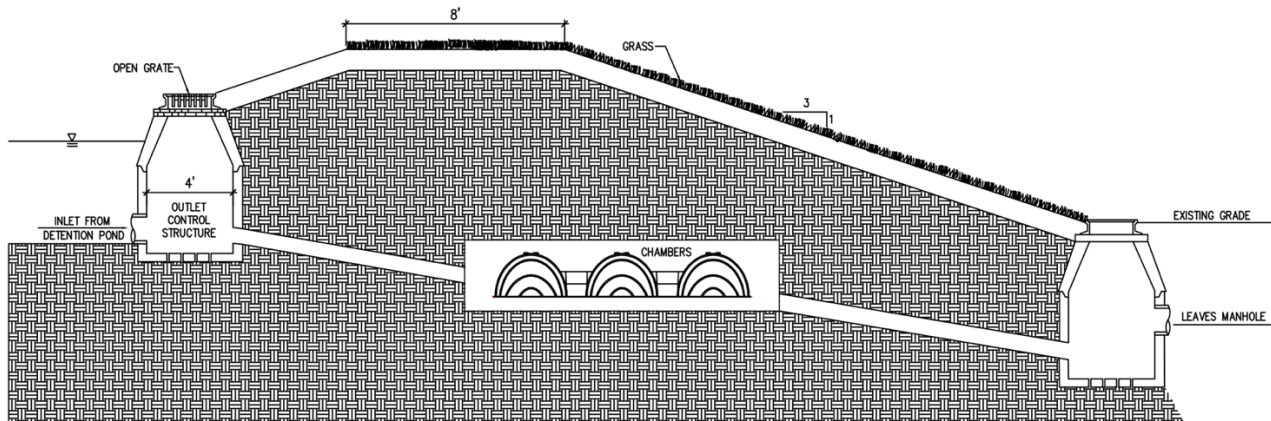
Elevation view of outlet structure, subsurface chambers, and manhole
